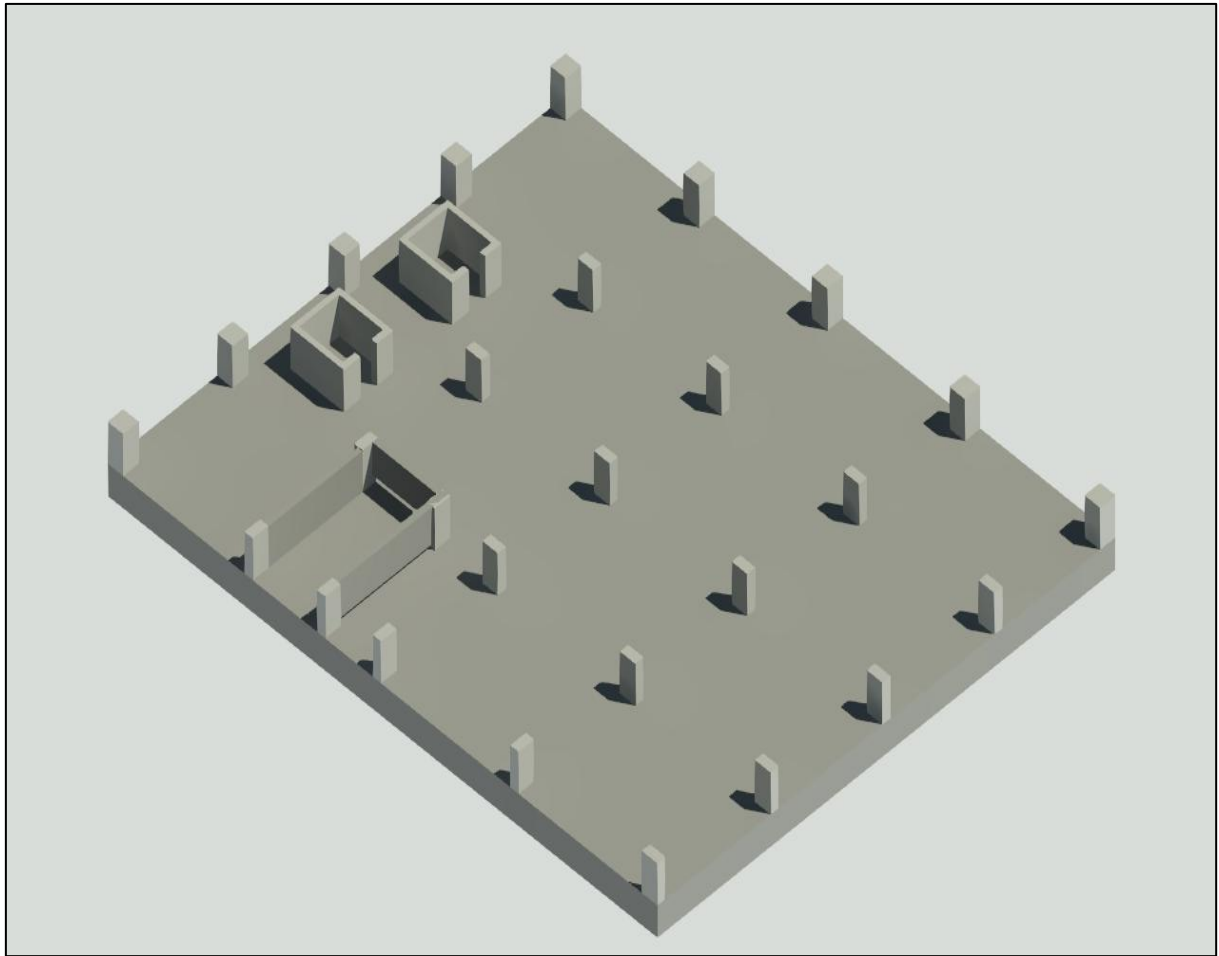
Modeling the Construction of Columns on the Ground Floor.
